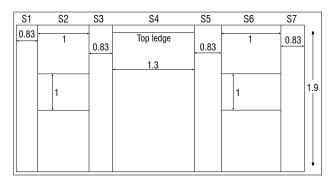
A preliminary plan of the informal structure (not drawn to scale).
